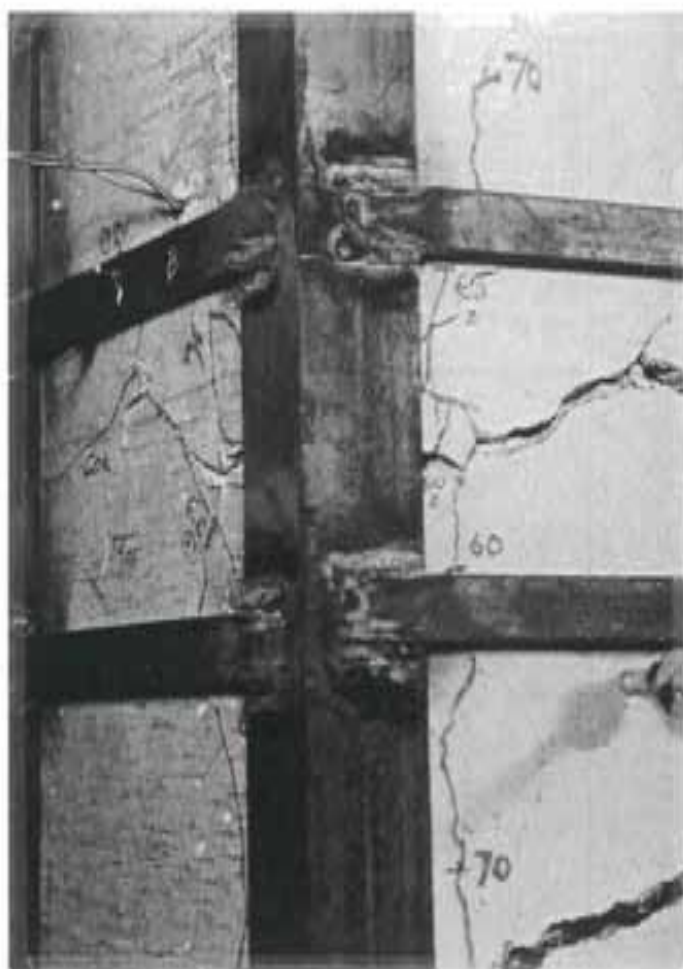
Column specimen U-SS6-UG-1 at failure
